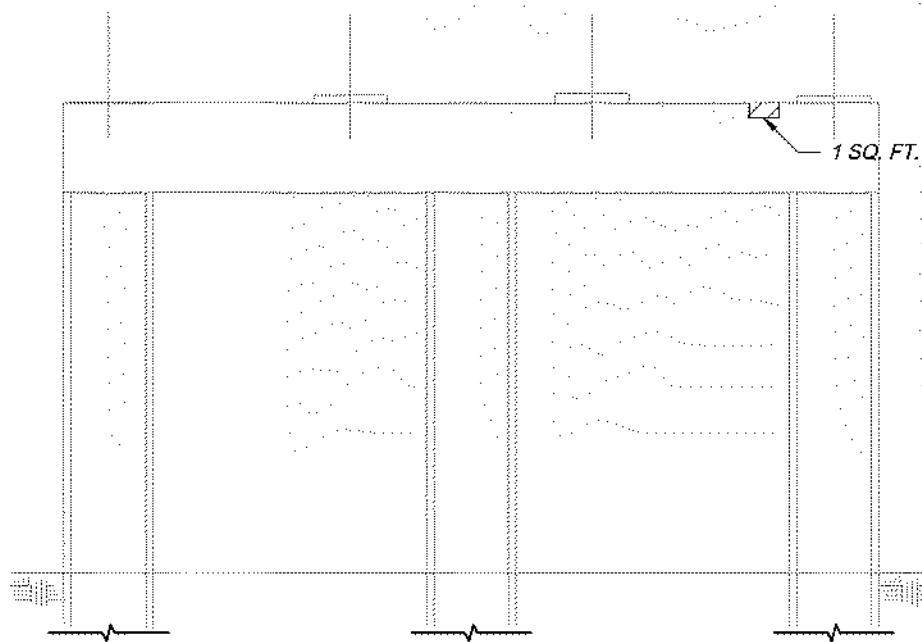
Location of Proposed Concrete Repairs - Pier 2 Upstation (South) Face Elevation MP 182.1
